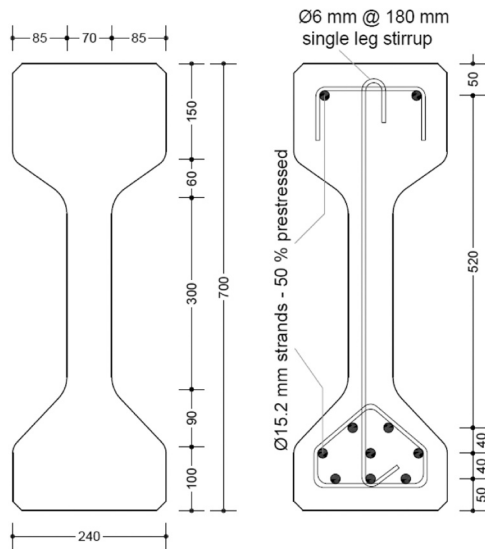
Cross section and reinforcement details of PC I-girder (mm).
